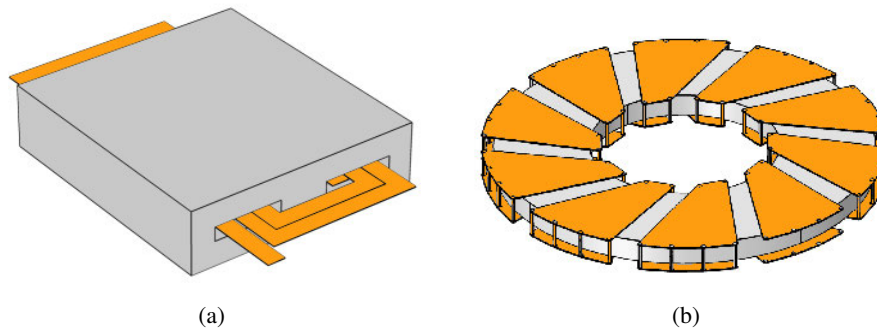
(a) Drawing of the "Planar" structure, where winding is formed on the PCB (dielectric layers not shown) and a magnetic core is clipped around. (b) Drawing of the "Embedded Toroidal" structure, where the magnetic core is embedded inside the PCB (dielectric layers not shown), prior the patterning of the copper layers to form the winding.
